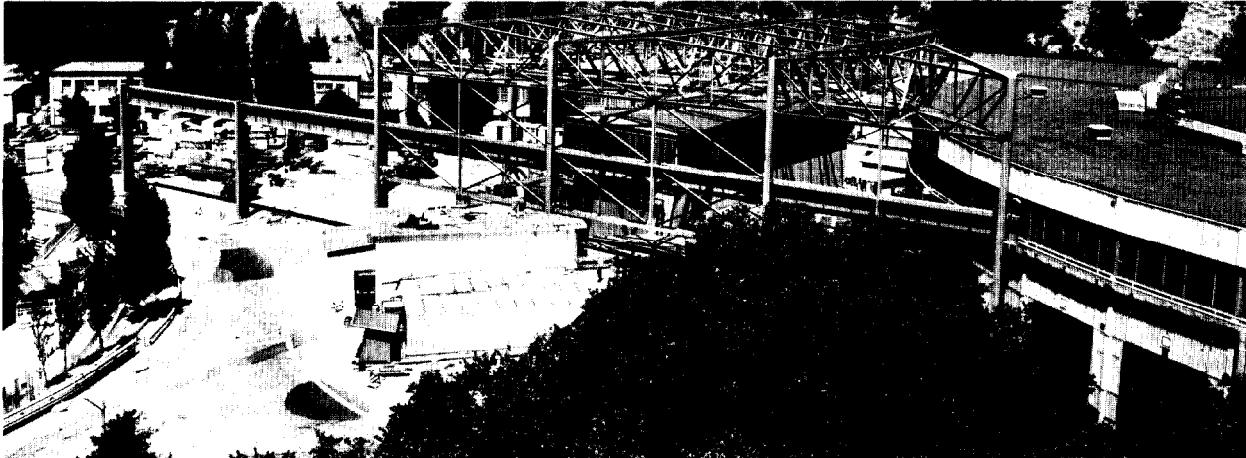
Construction progress July 15, 1966, new steel framework around existing bubble chamber building.
